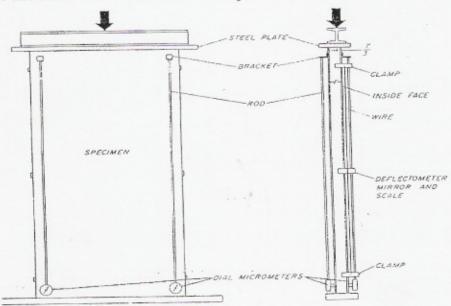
Test Setup for Compressive (Axial) Loading (from "ASTM E72-98, Fig. 2")
